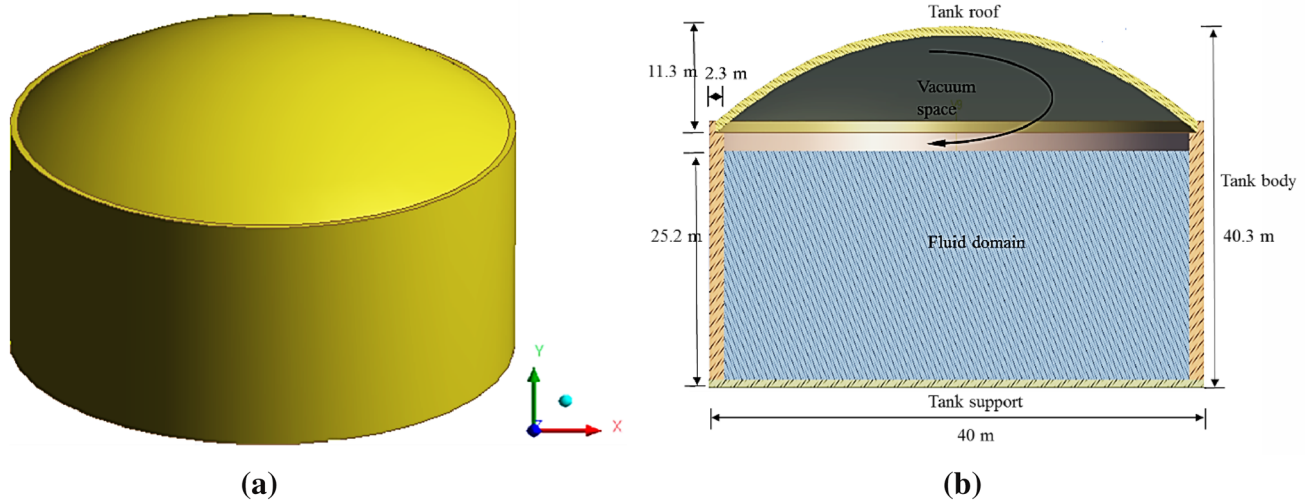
a 3-D tank model geometry and b symmetric view of the geometry showing section dimensions
